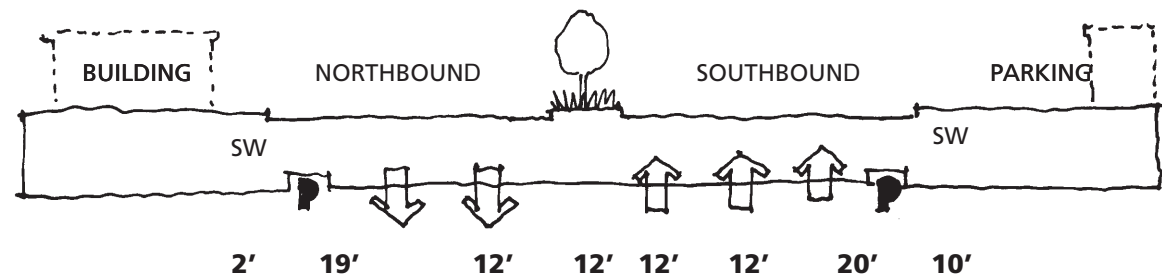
Improved street section in the southern part of the study area with the addition of the median. View looking south.
